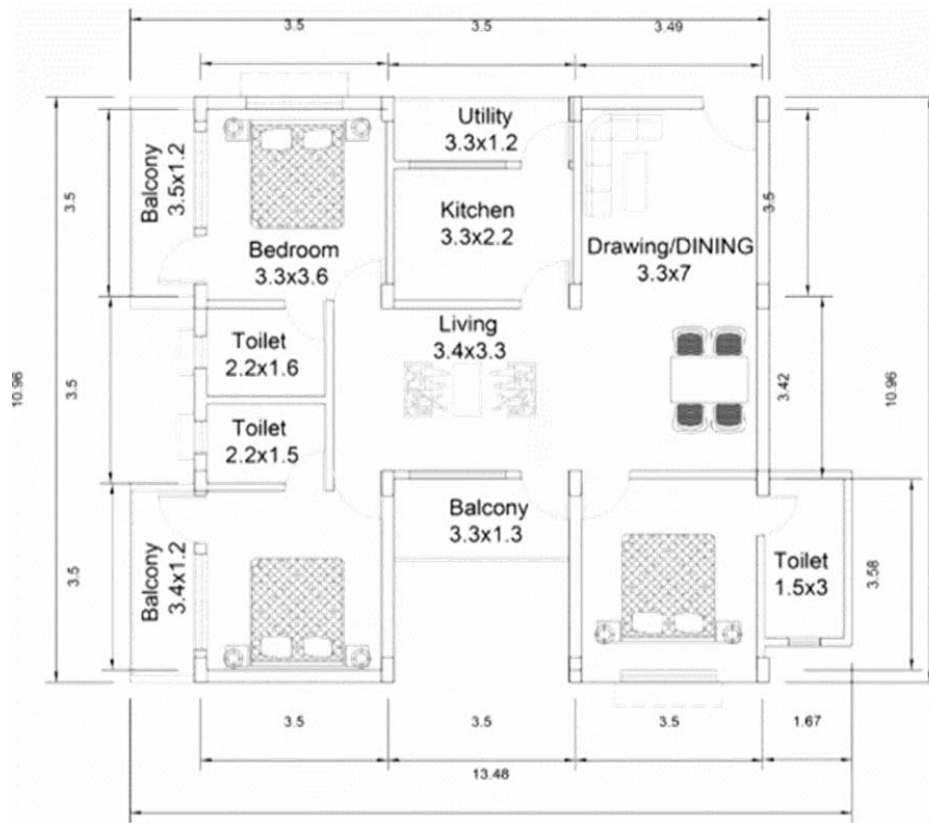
Typical floor plan for 3 BHK (1 unit)
